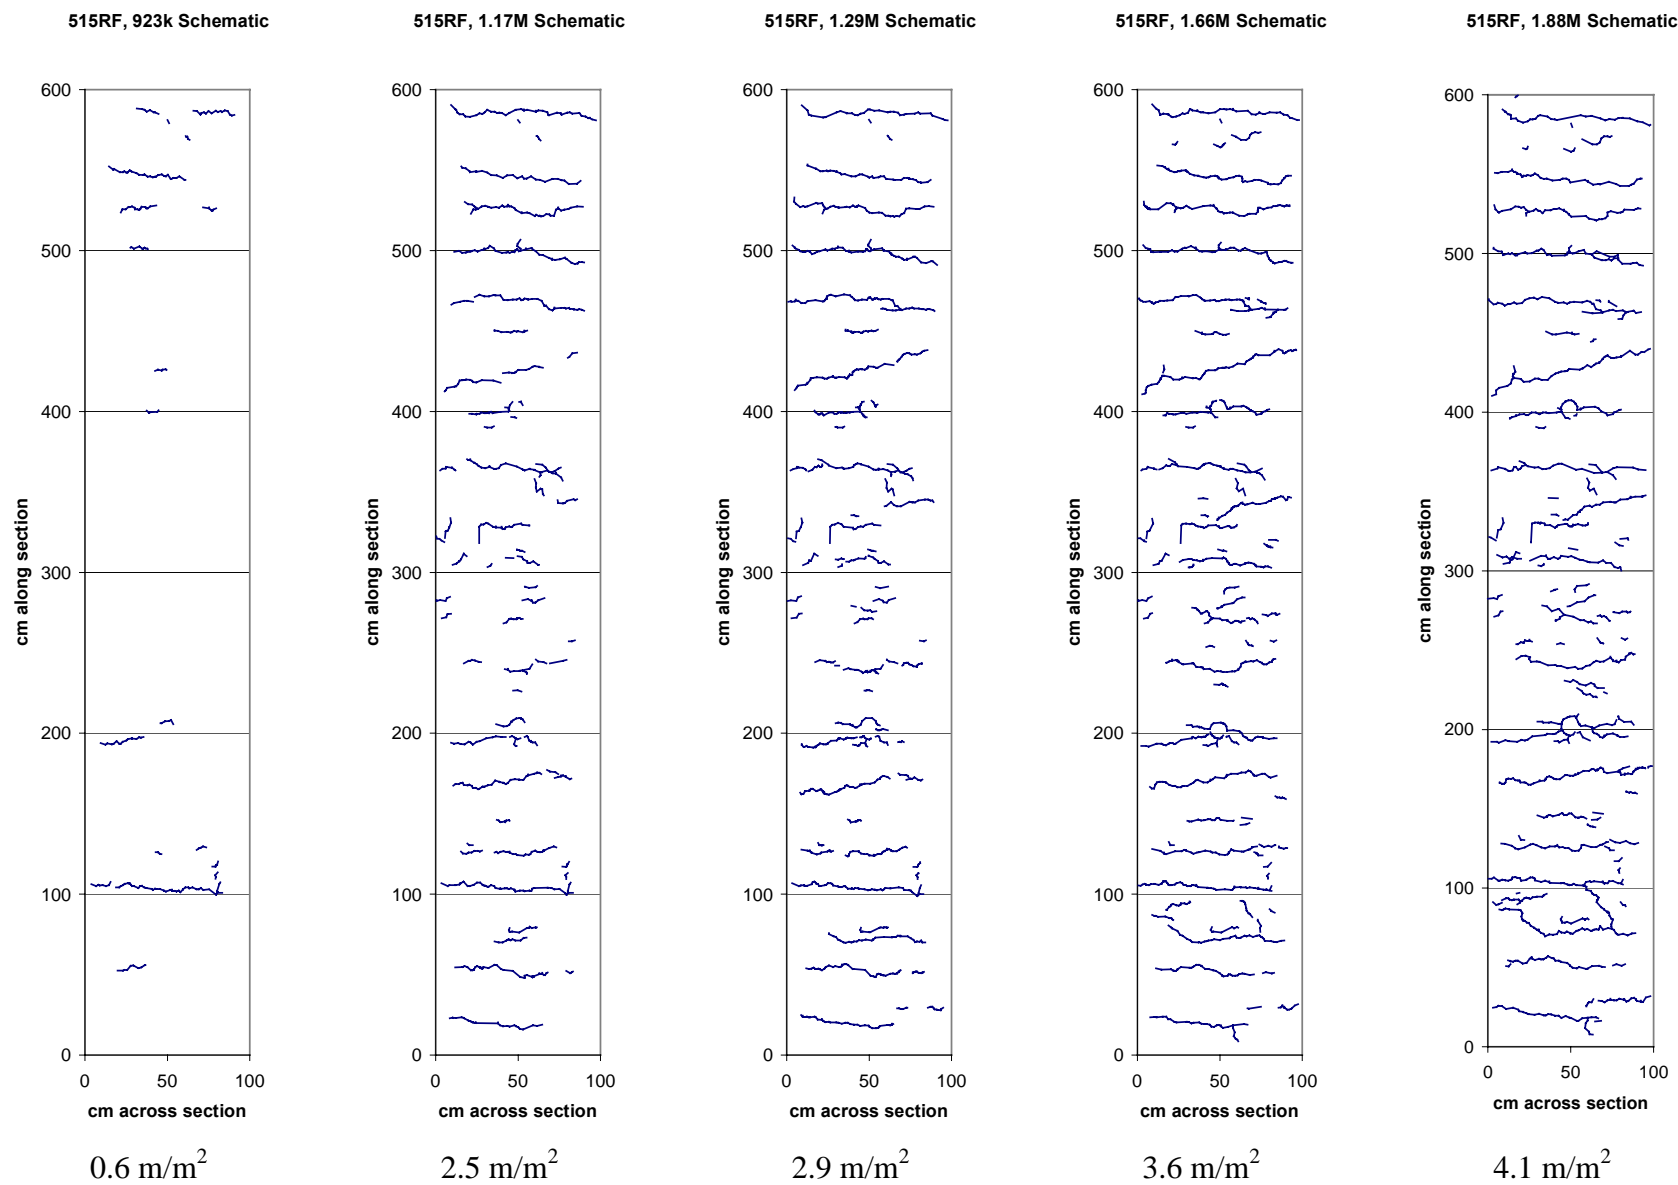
Crack development in Section 515 (drained, ARHM-GG overlay).
